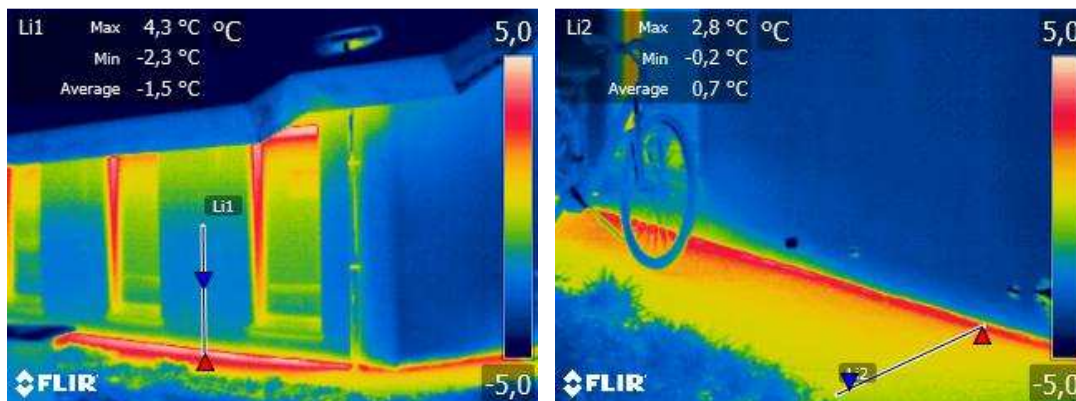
Ground slab thermal bridge and sidewalk temperatures, outdoor IR image 19/03/2013.
